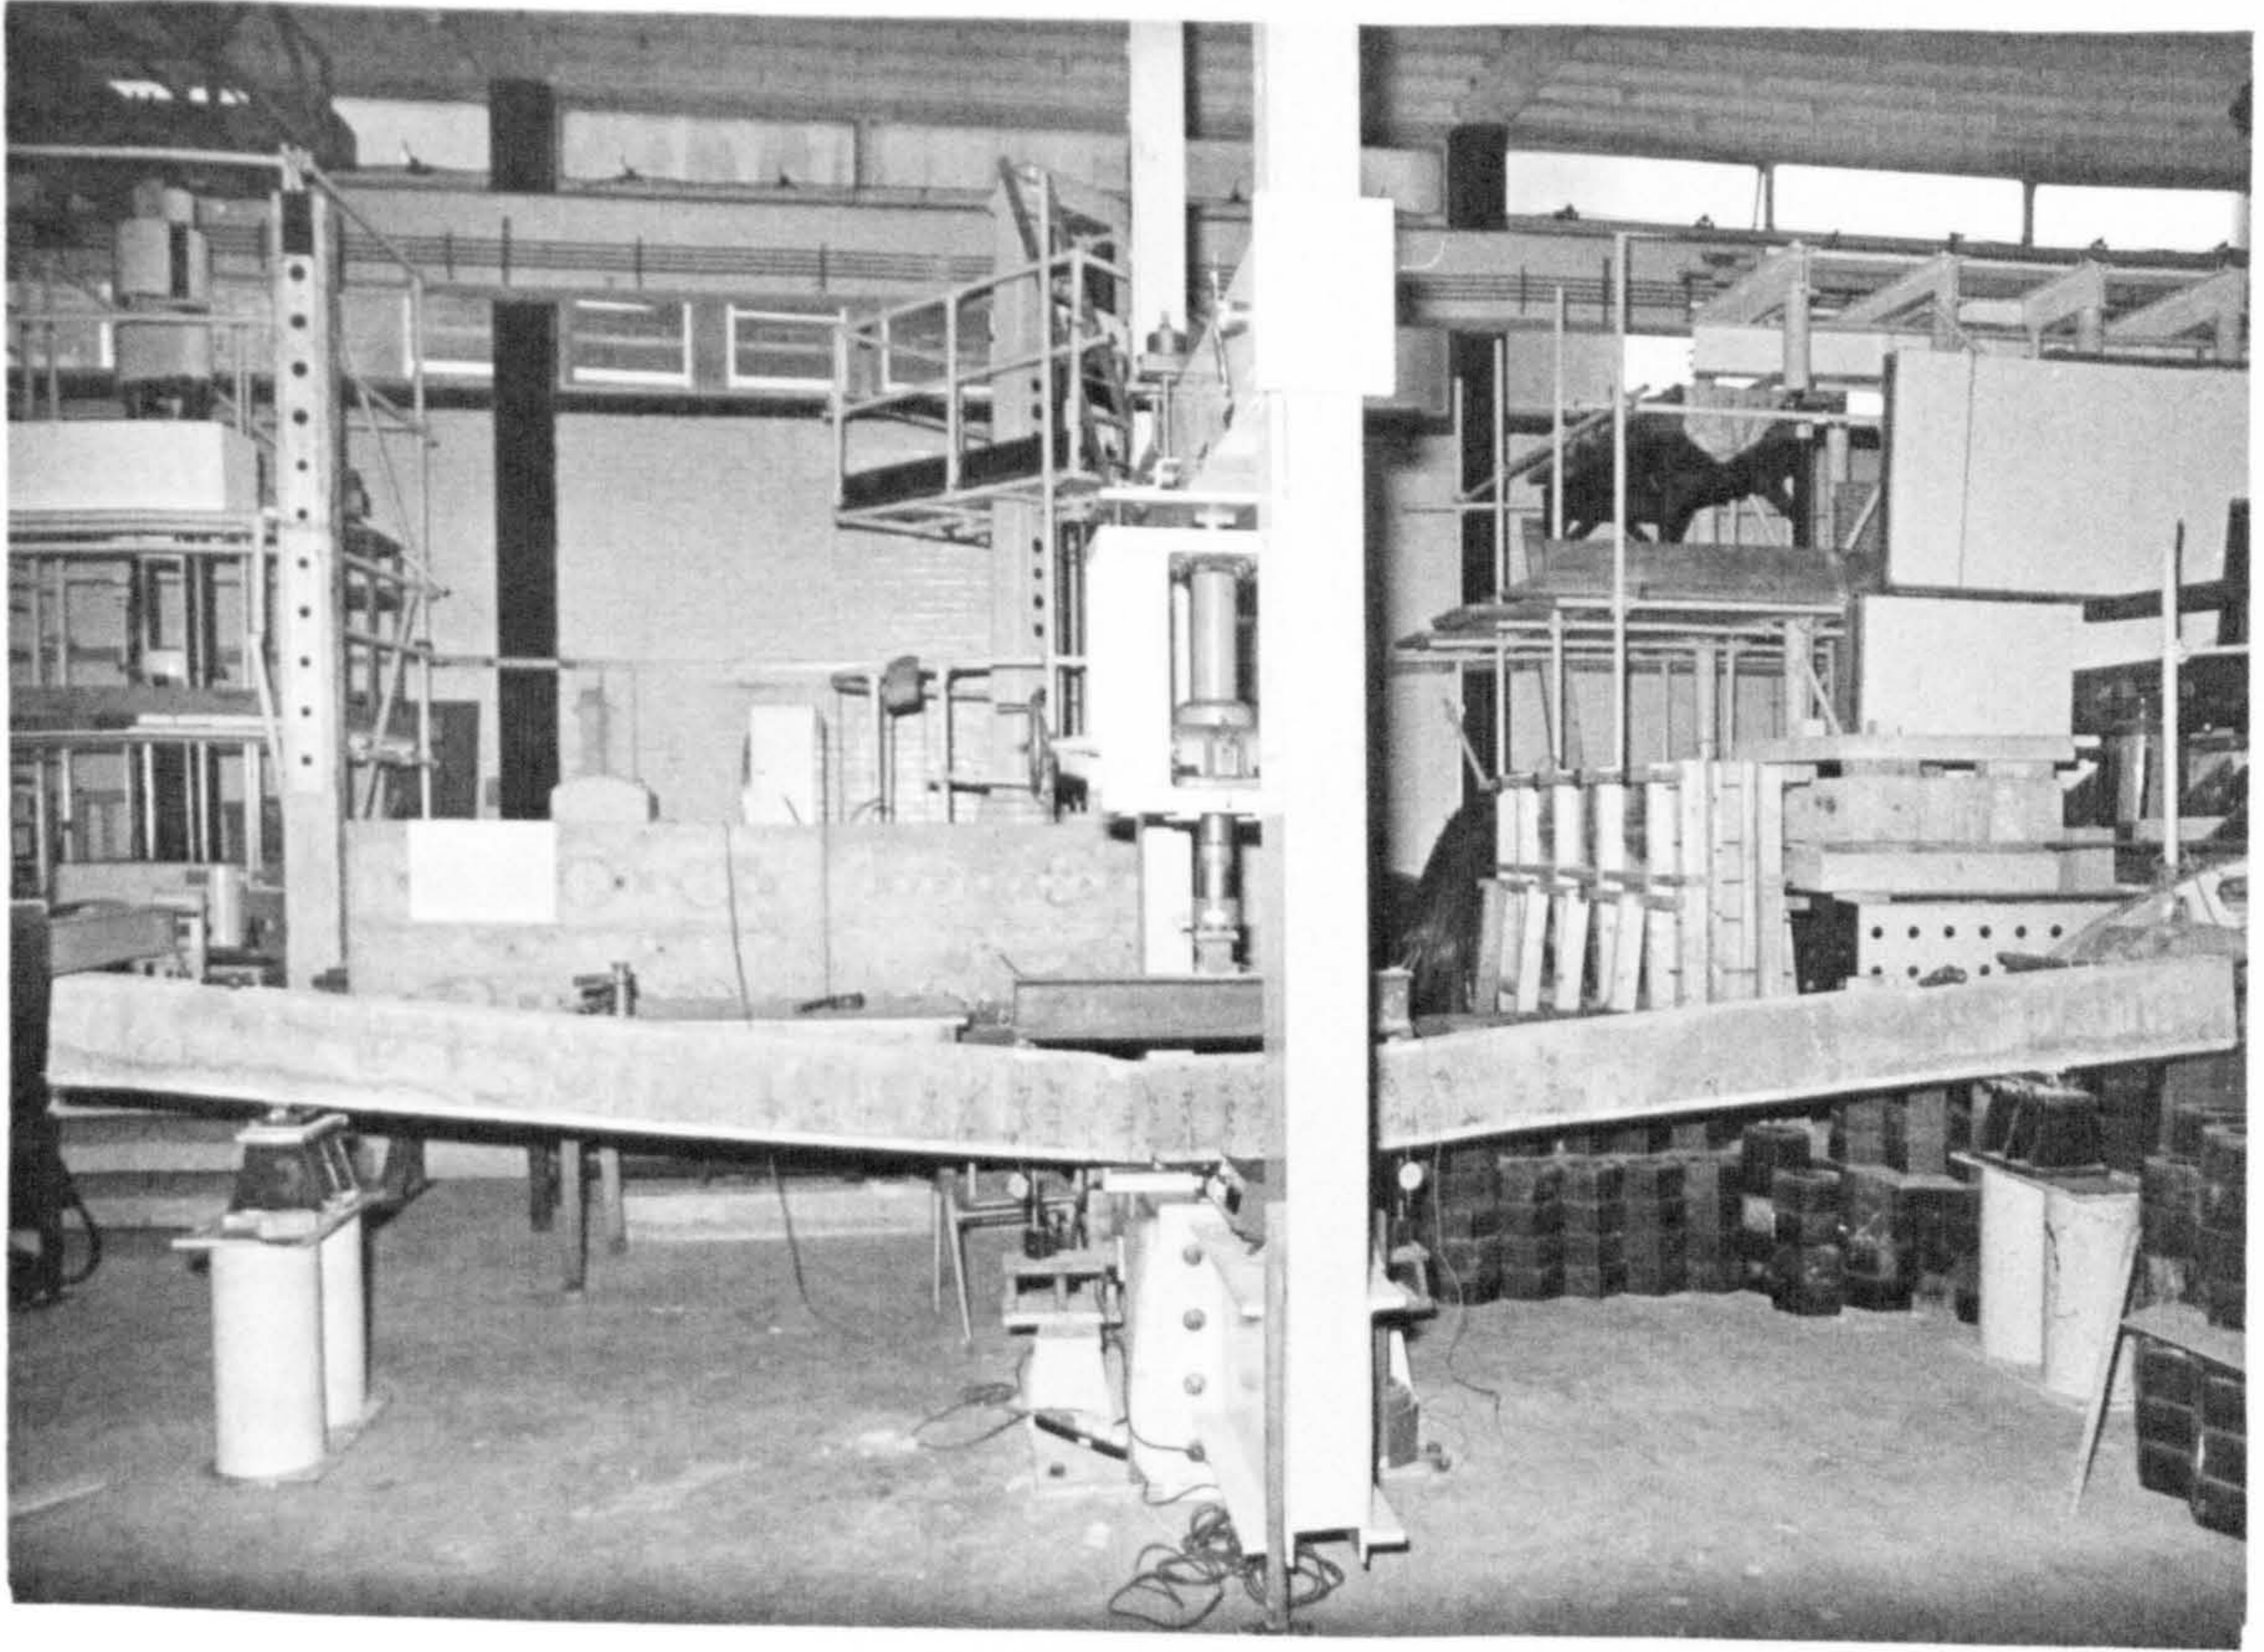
MODEL 2 LONGITUDINAL SECTION 1 UNDER TEST
